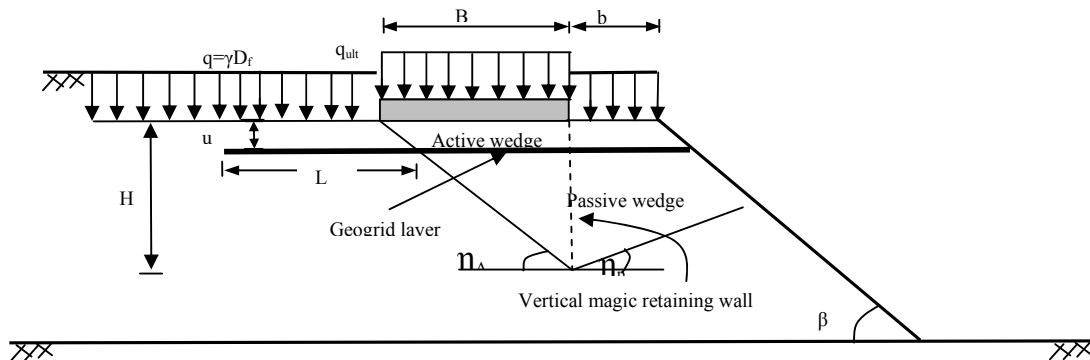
Proposed failure mechanism for reinforced soil-footing system
